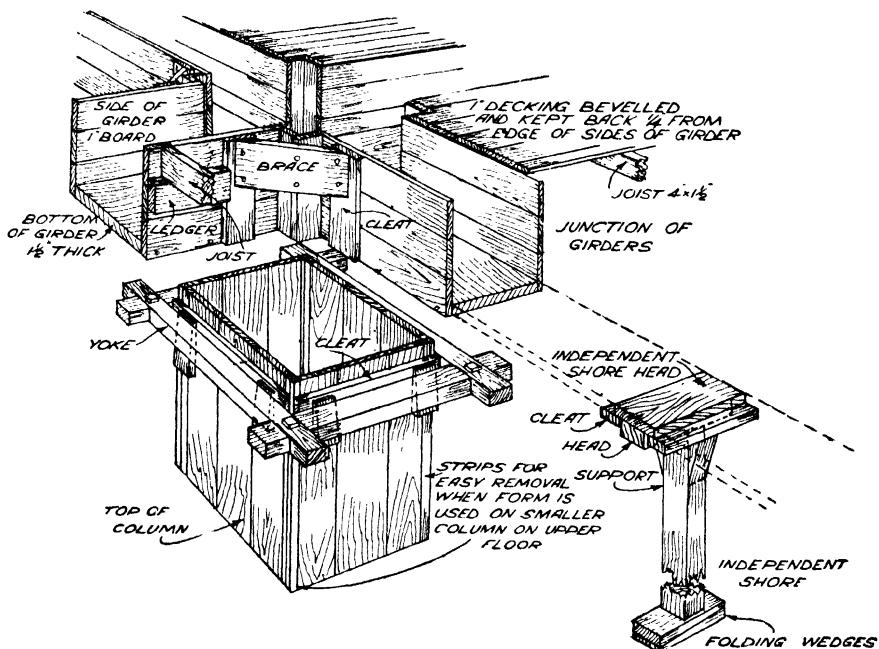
FORMS FOR JUNCTION OF GIRDERS AT B IN FIG. 1
